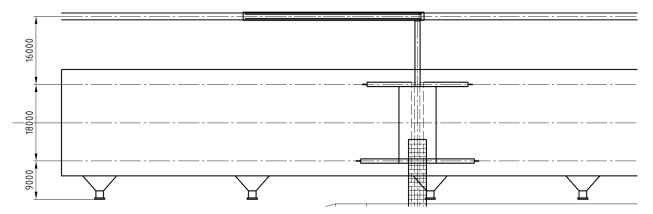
Plan of Single Shiploader (Dimensions in mm)
